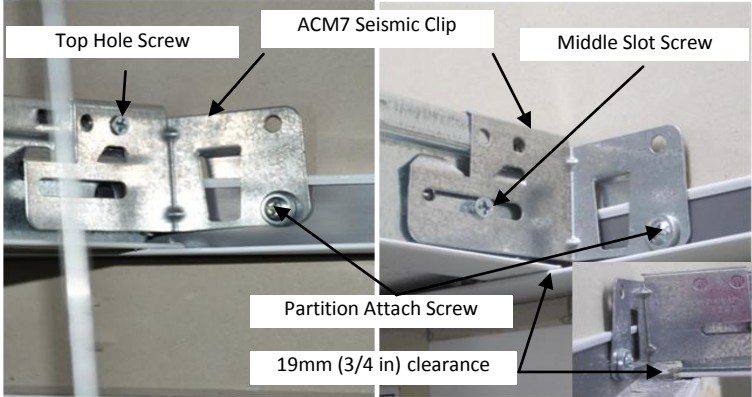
Joint between runners/cross tees and wall molding: (a) attached Detail, and (b) unattached detail (free to float)
